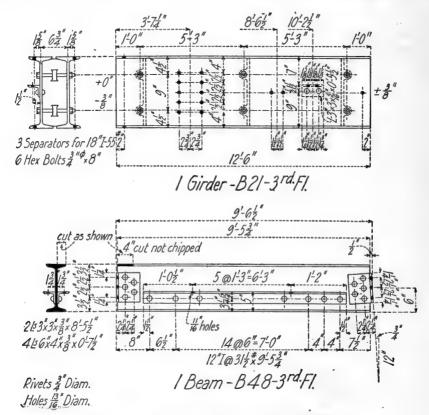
STANDARD DETAILS FOR ROLLED BEAMS.
